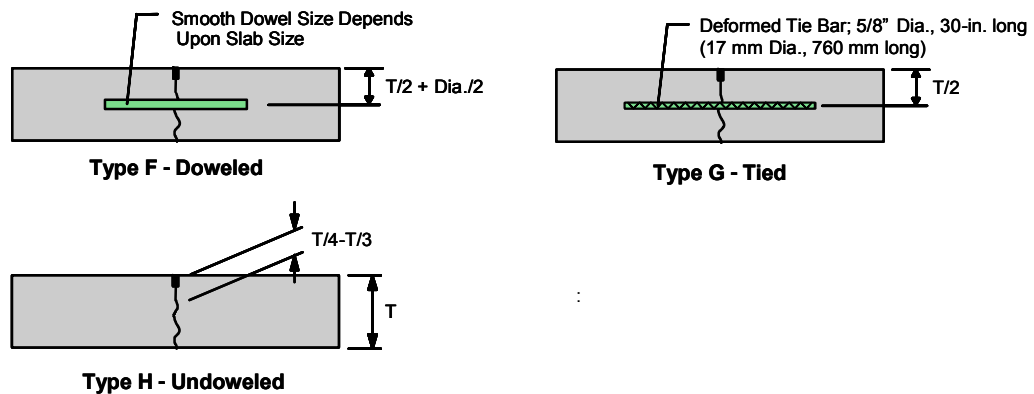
Airport Concrete Pavement Joint Types (courtesy of the American Concrete Pavement Association)
